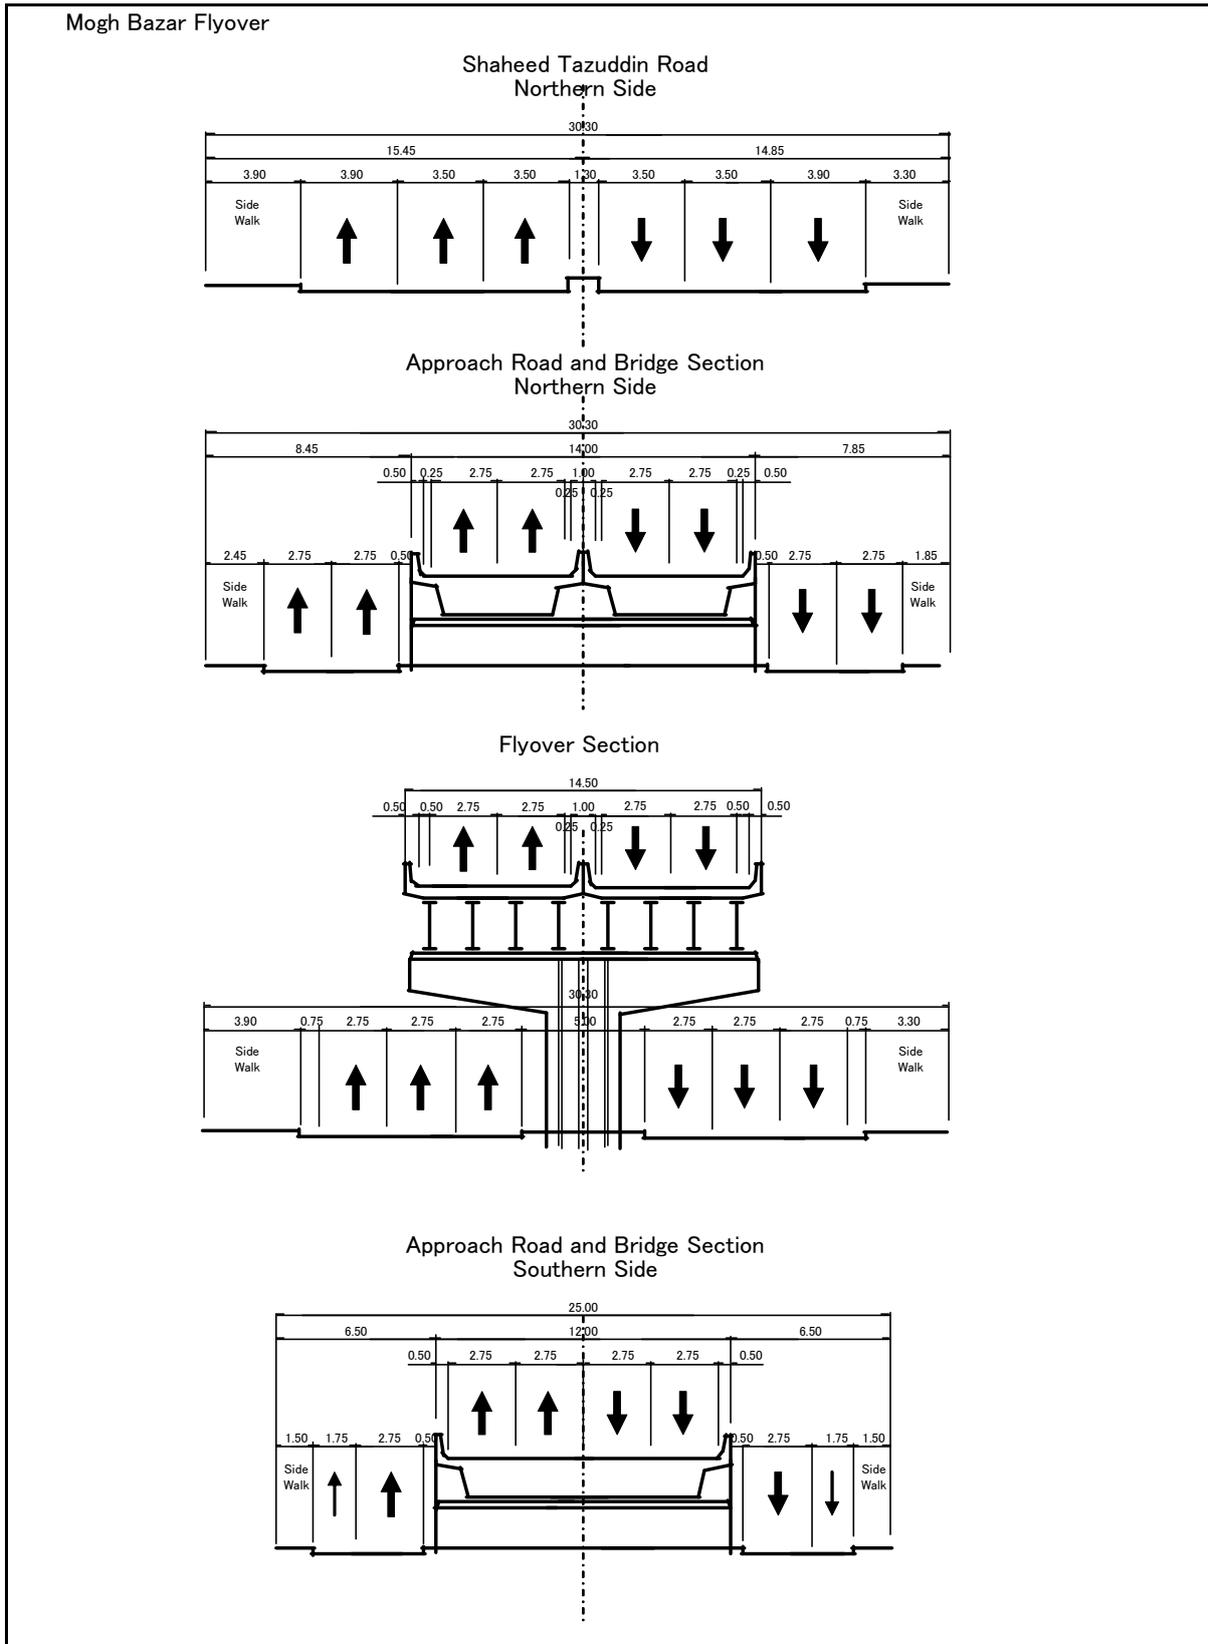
Cross Section of Mogh Bazar Flyover Plan
